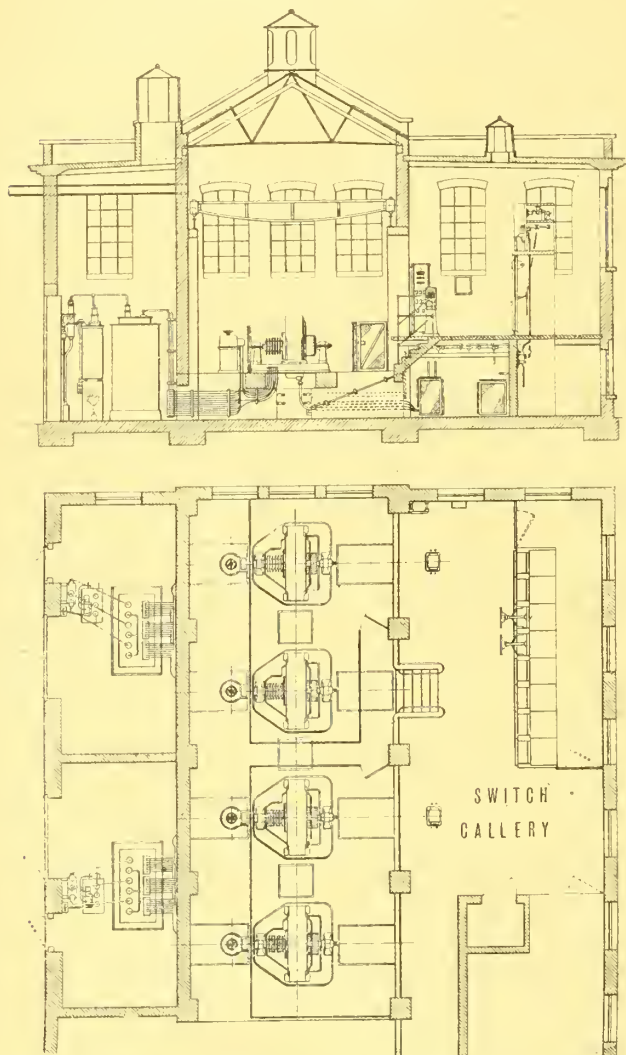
PLAN AND ELEVATION OF THE AYCLIFFE SUB-STATION.
